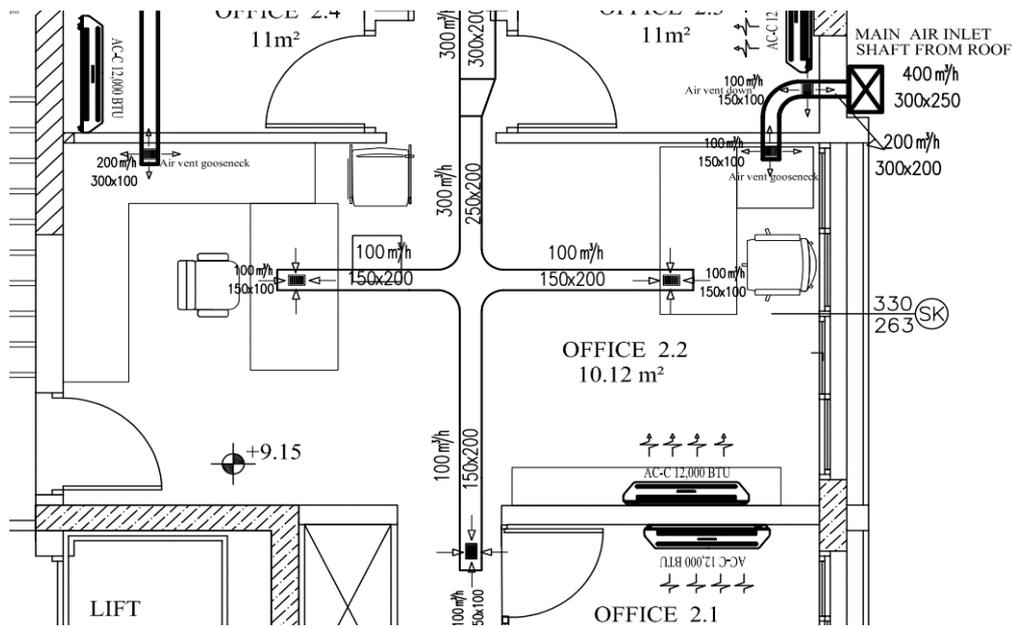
Planning scheme of exhaust ducts on the working spaces and fresh air gooseneck inlet vents at side walls
